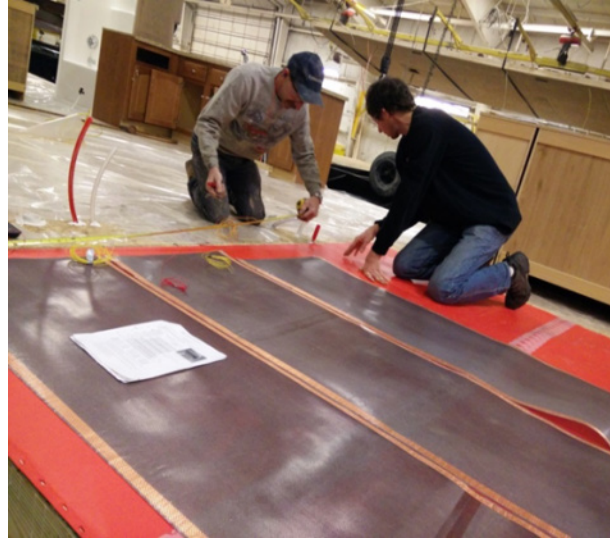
Laying out and wiring electric heat floor mats in master bathroom
